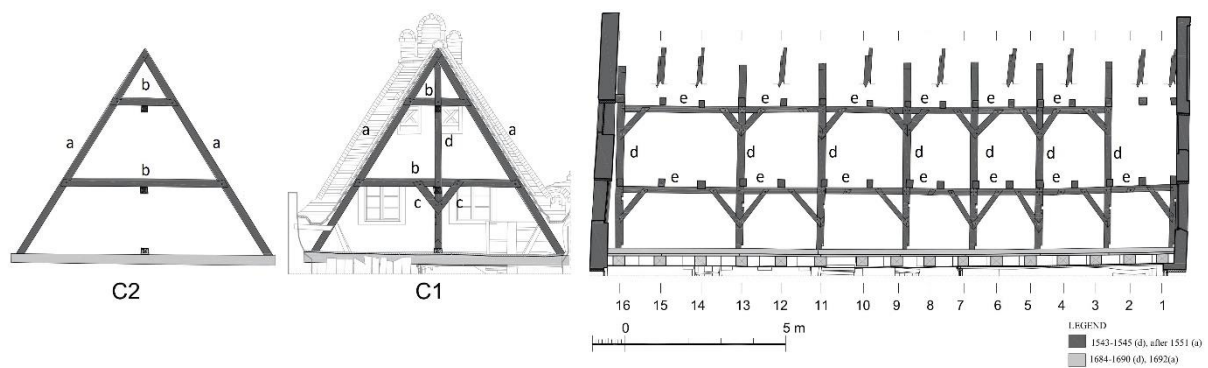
Toruń, 6 Mostowa Street. Roof structure of building C. Longitudinal and transverse cross-sections: C - principal rafter trusses; C1 - paired common rafter; a - rafter, b - collar, c - brace; d - king struts; e - spanderal beam (compiled by U. Schaaf, M. Prarat).
